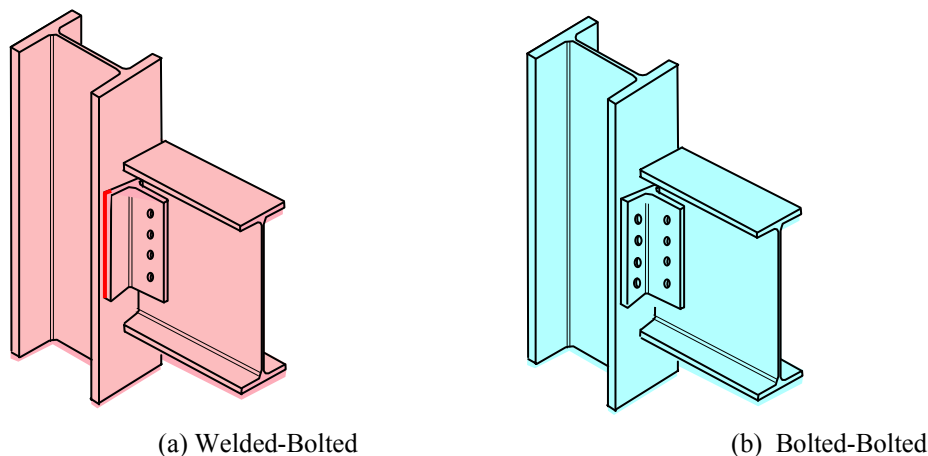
Welded-Bolted and Bolted-Bolted Tee Shear Connections
